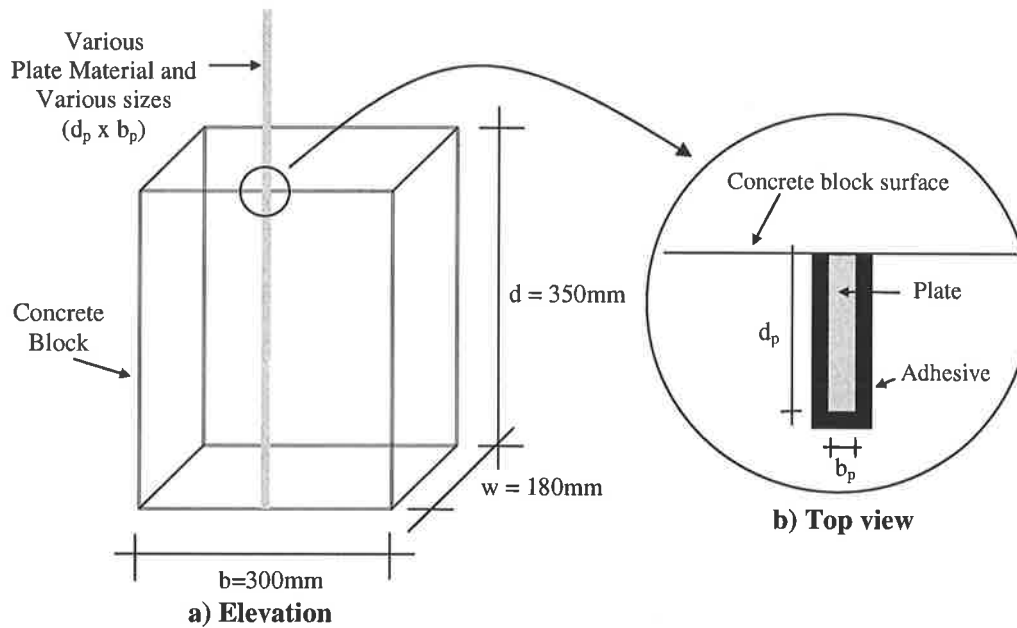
Near-Surface Mounted pull test specimen details.
